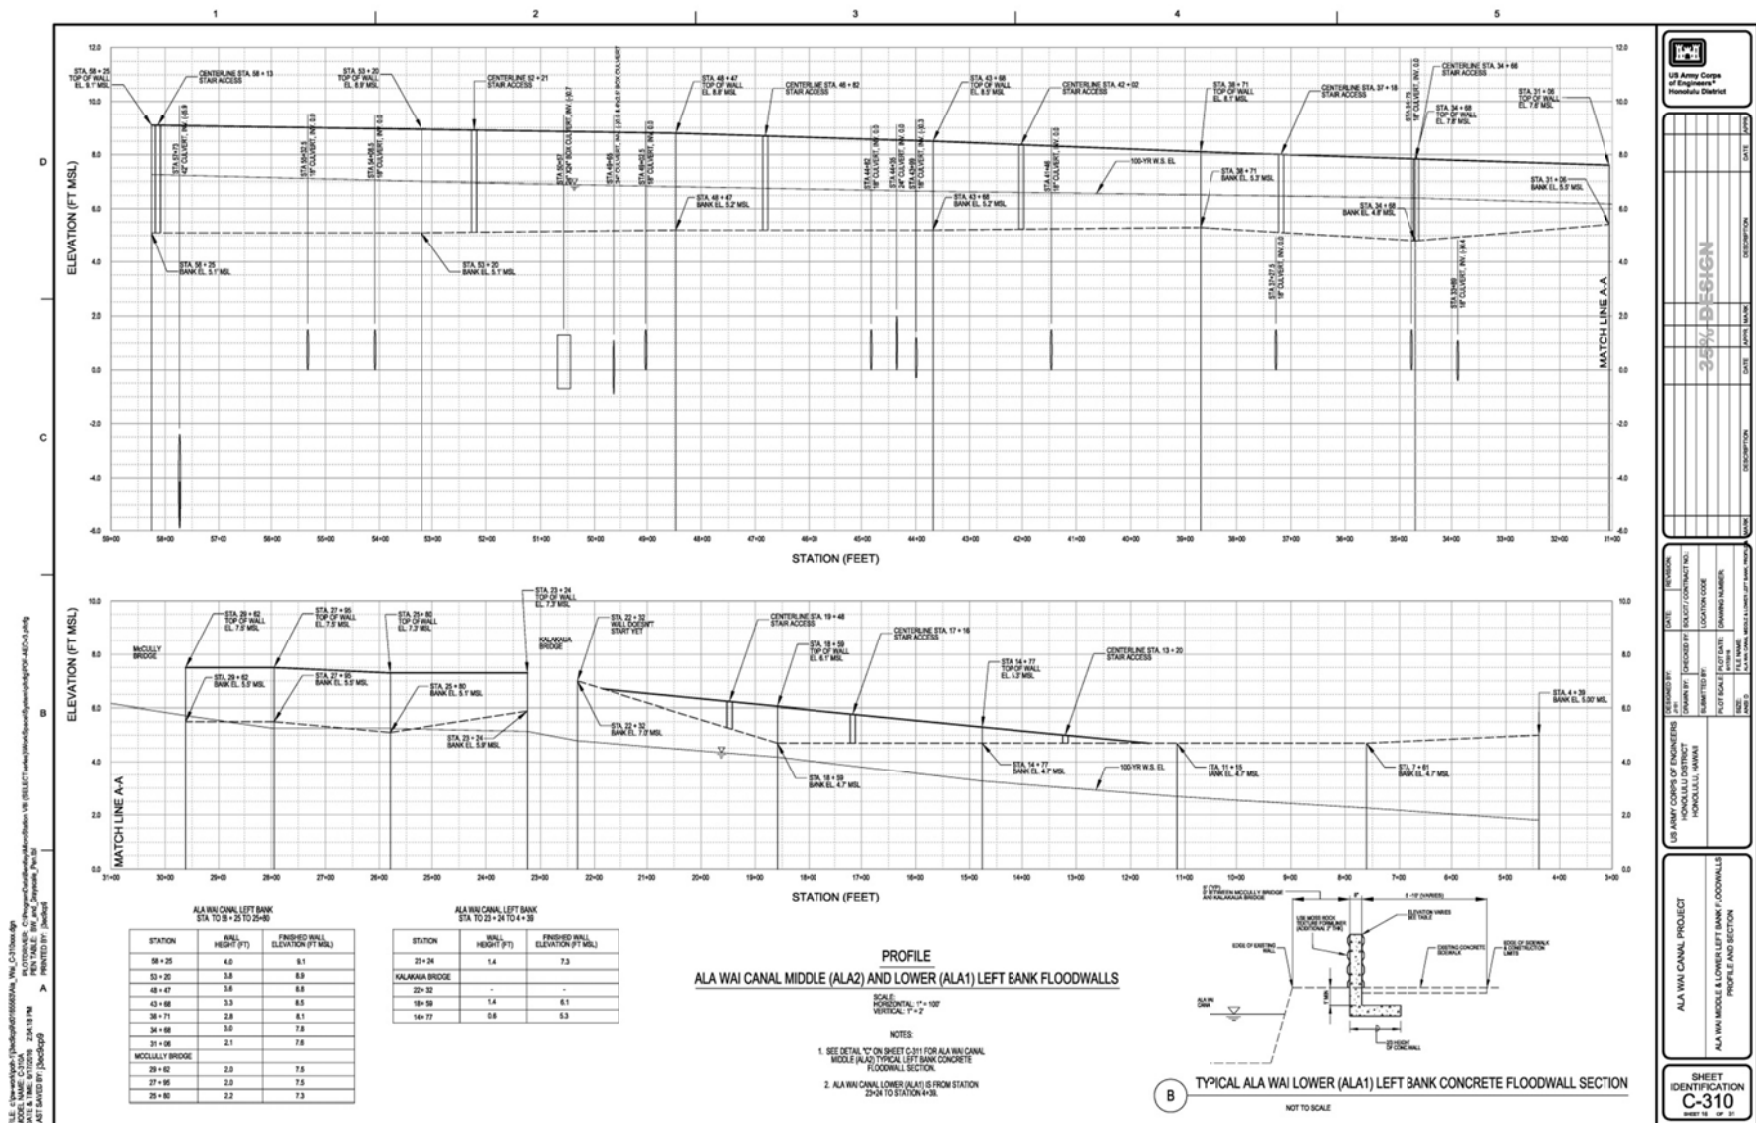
Ala Wai Canal Middle and Lower Left Bank Floodwalls Design Plan.
